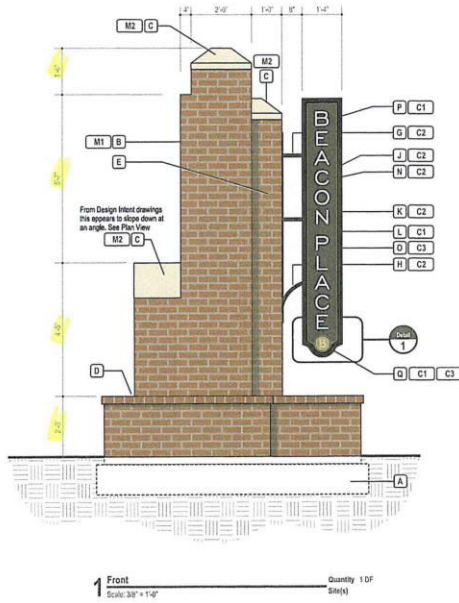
EXHIBIT D: PROPOSED SIGNAGE PLANS (CONT)
